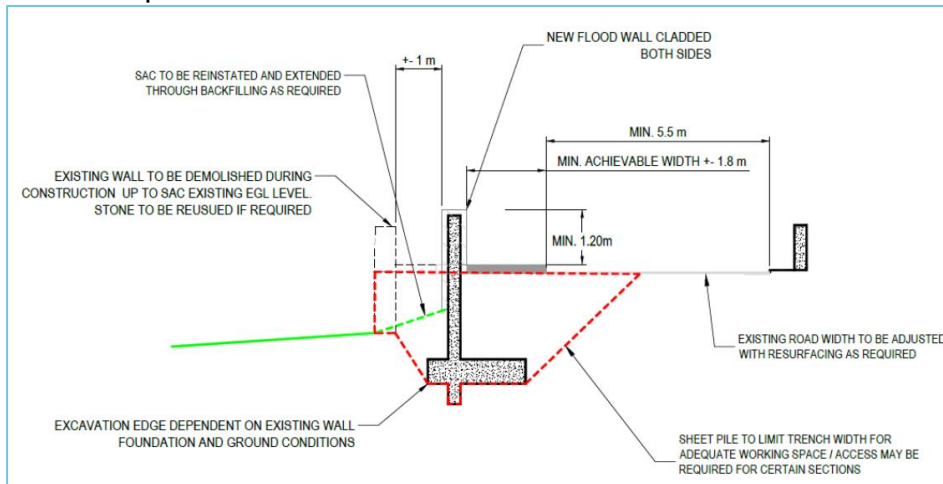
Proposed flood wall cross section, showing that it will be constructed within the road area and away from the riparian habitat and SAC
